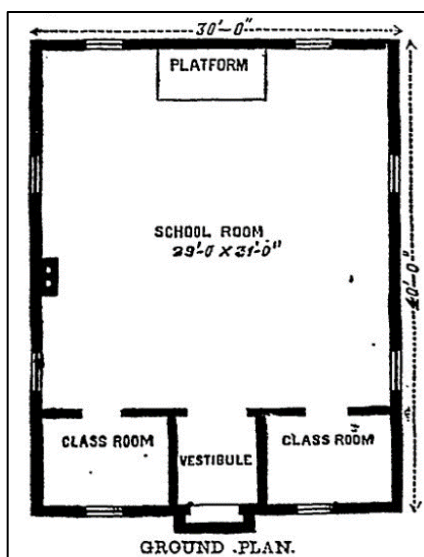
Prospective one-room schoolhouse floorplan (*The Canada Farmer*, Vol. 3, no. 12, p.189)
